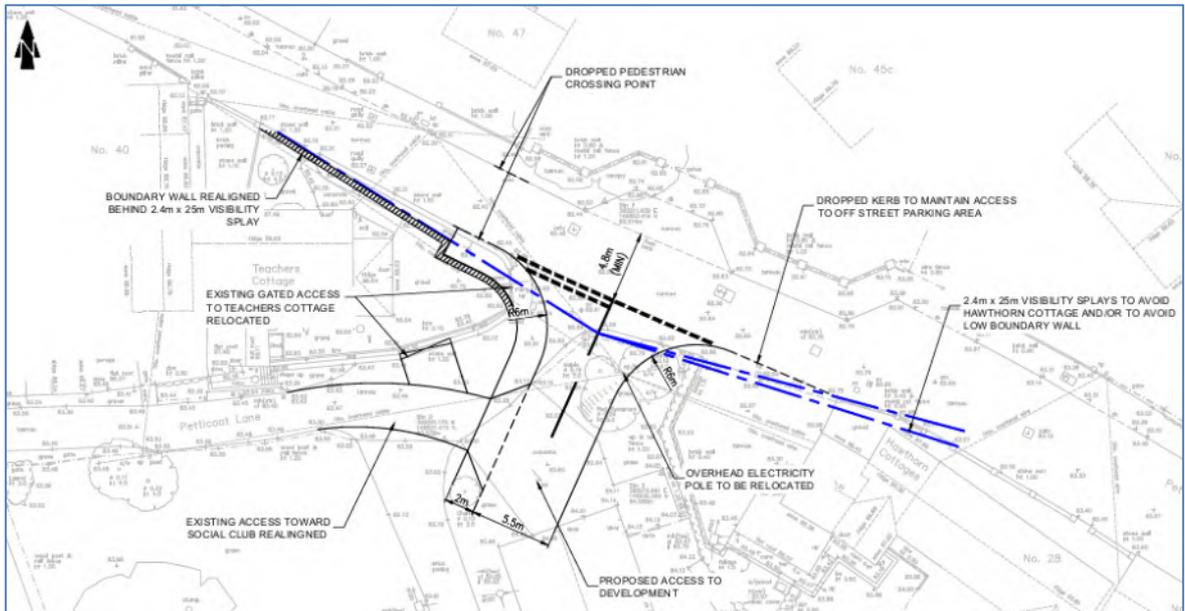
Extract from the Transport Technical showing the geometrical layout of the proposed access to the site.
